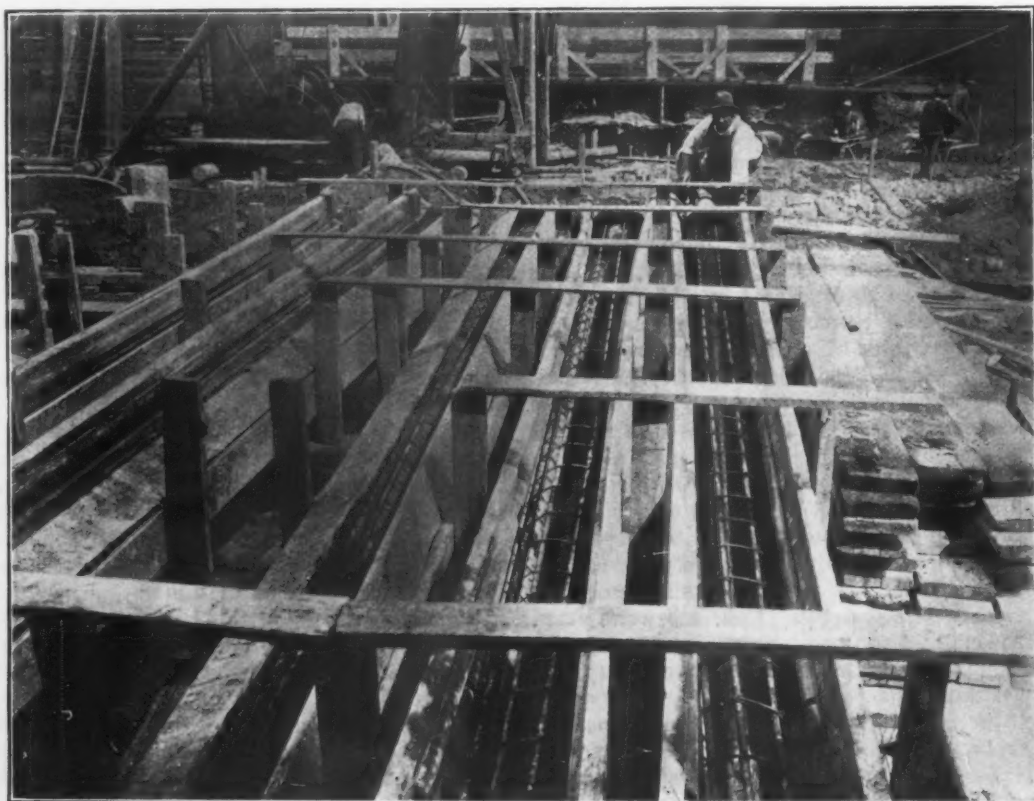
Molds for Gilbreth Reinforced Concrete Piles.
